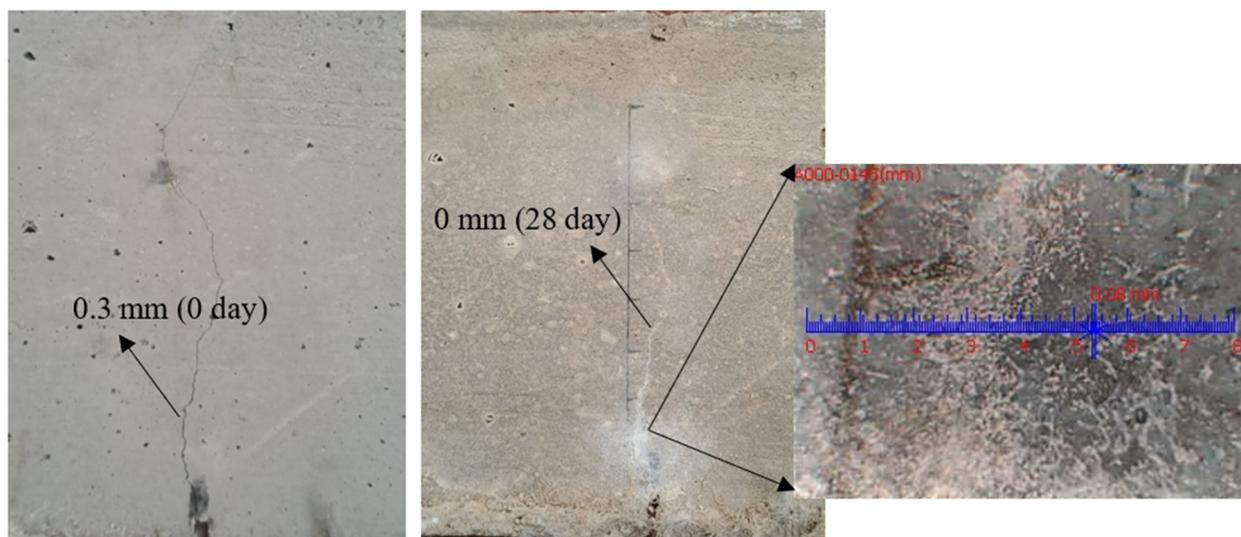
Crack width healed in Beam “TCHS-1” using the crack-healing solution.
